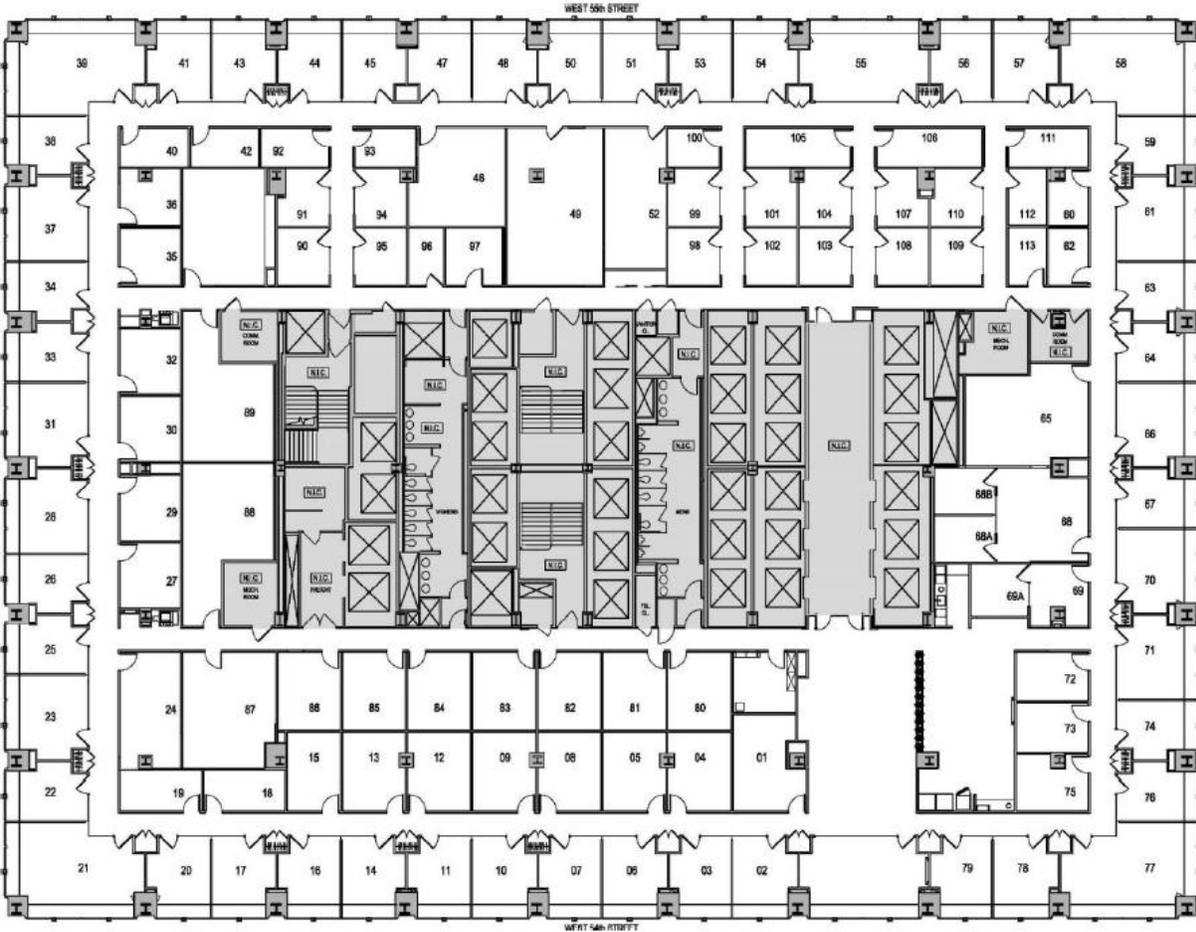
Typical plan of 1345 Ave of Americas<sup>41</sup> (open-source image)
